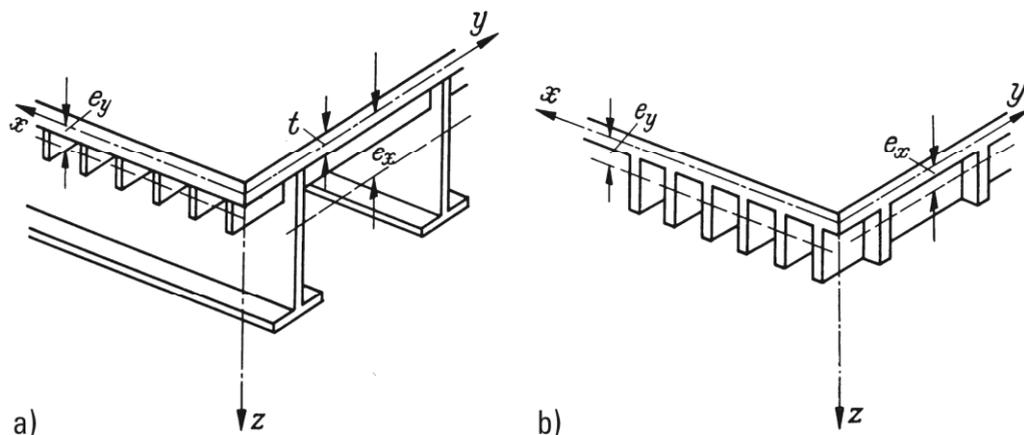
,b. Plate cross-sections around 1960; flat steel plate (bridge-building)-a), integral plate (aircraft construction)-b)
